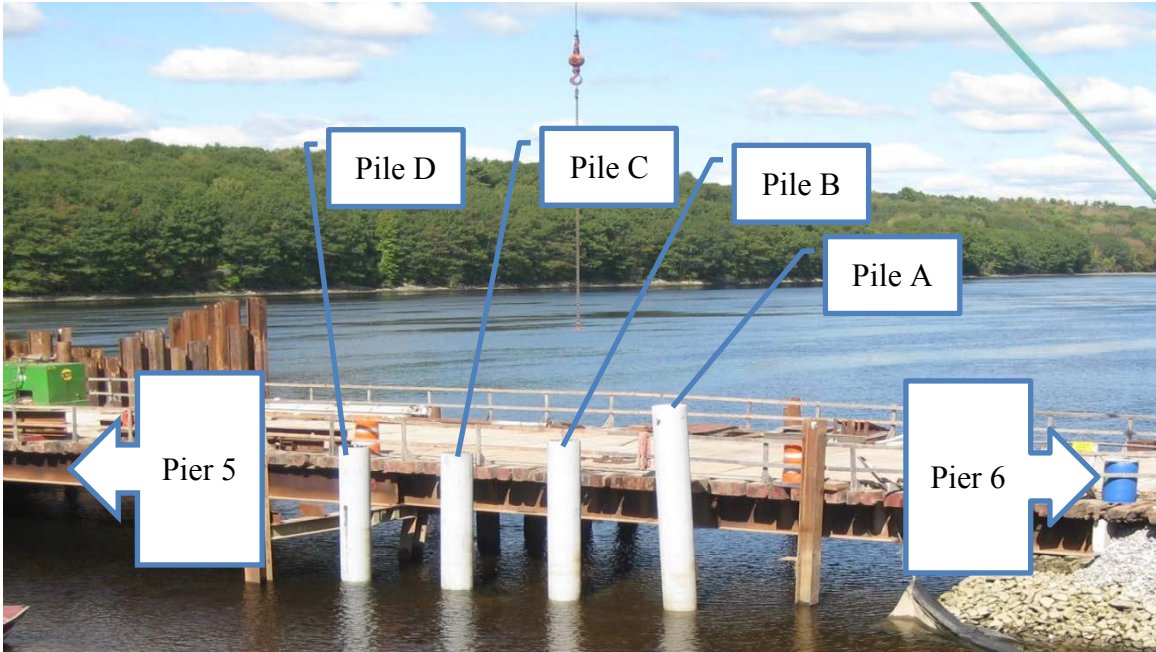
Configuration of Driven Piles (Looking Upstream)
